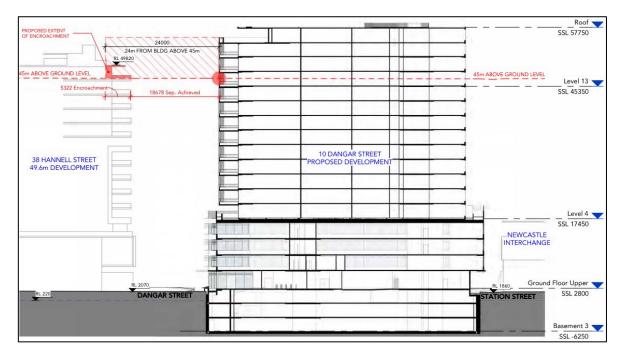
Extract of 'Hannell St Development Street Context Section' (source: Team 2 Architects)
